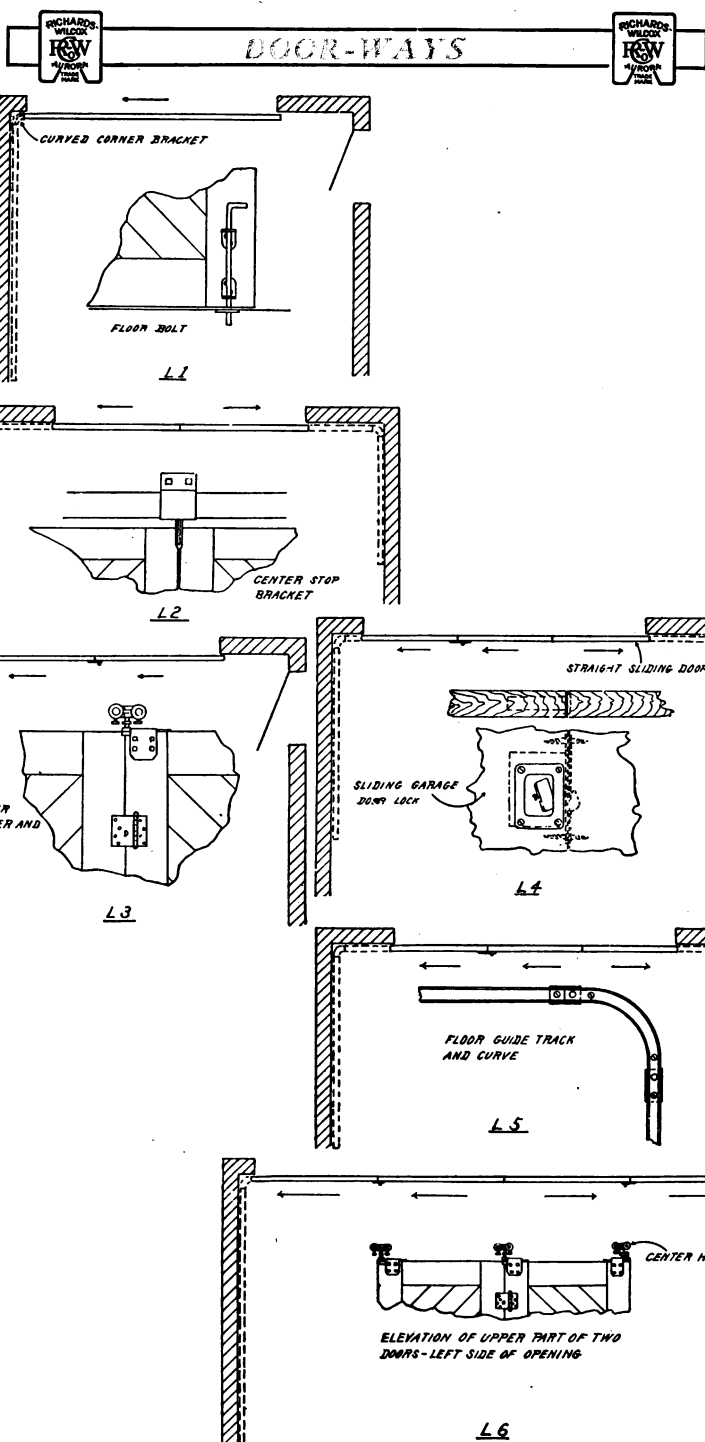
Various Plans which Can be Used for Receding Garage Doors; also some Details of Construction
